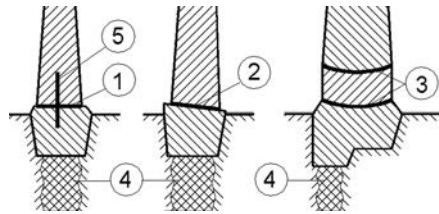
Alternative solutions at the joint between the concrete diaphragm wall and foundation. (1) Horizontal joint; (2) inclined joint; (3) cylindrical joint; (4) grout curtain; (5) steel sheet.
